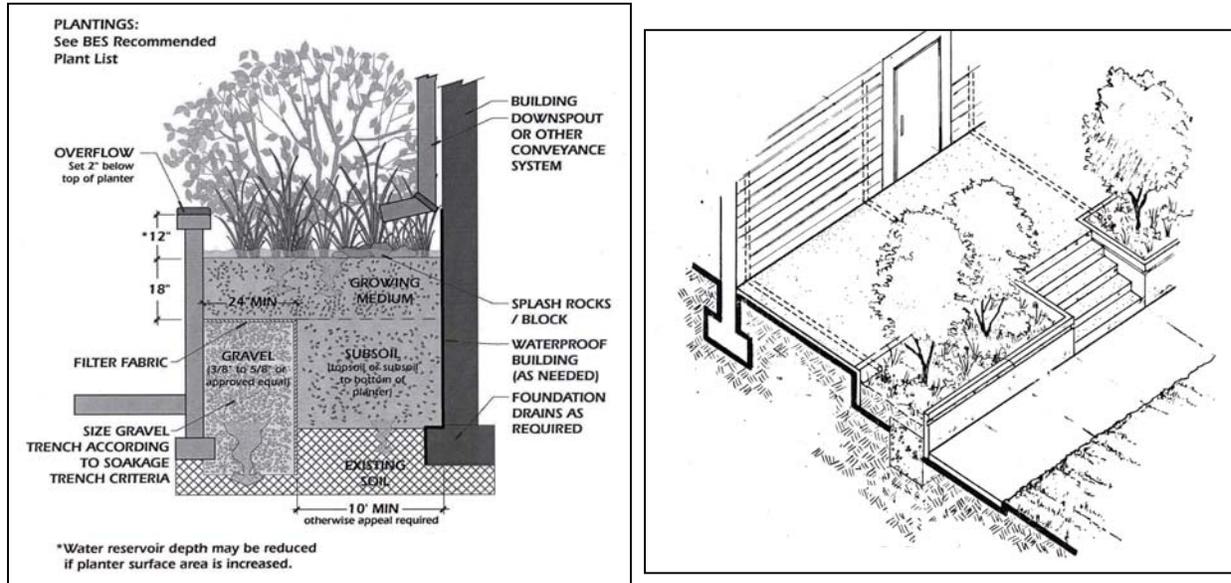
Infiltration Planter Schematic (left) and Infiltration Planter Box (right)
